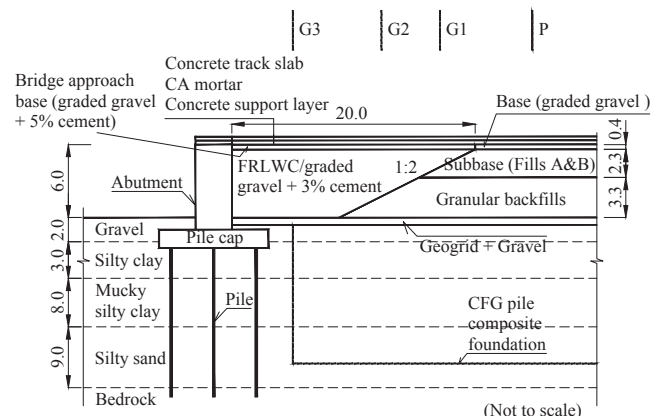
Cross section of bridge approach backfilled with fibre reinforced lightweight concrete (unit: m).
